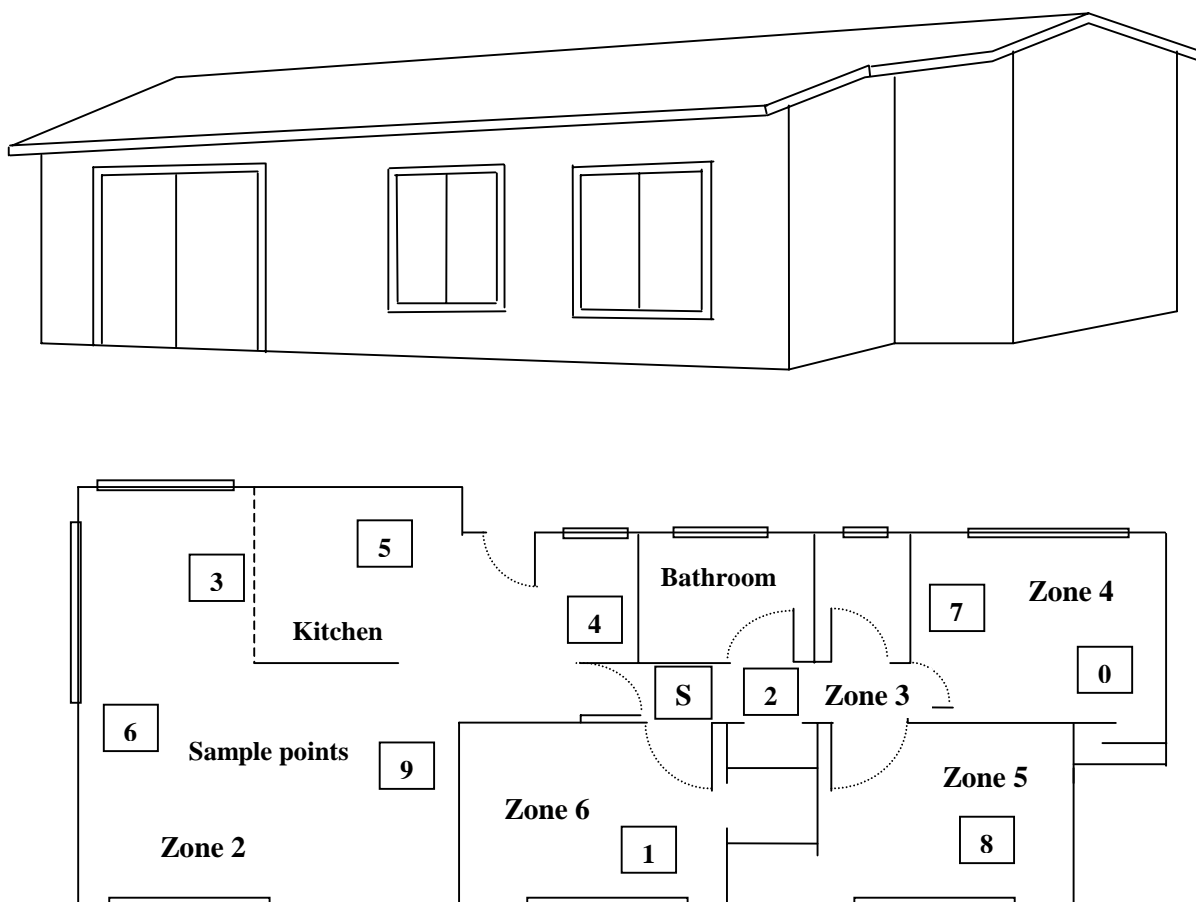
North elevation and floor plan of test house showing numbered tracer sampling positions and the mechanical ventilator supply point marked S.
